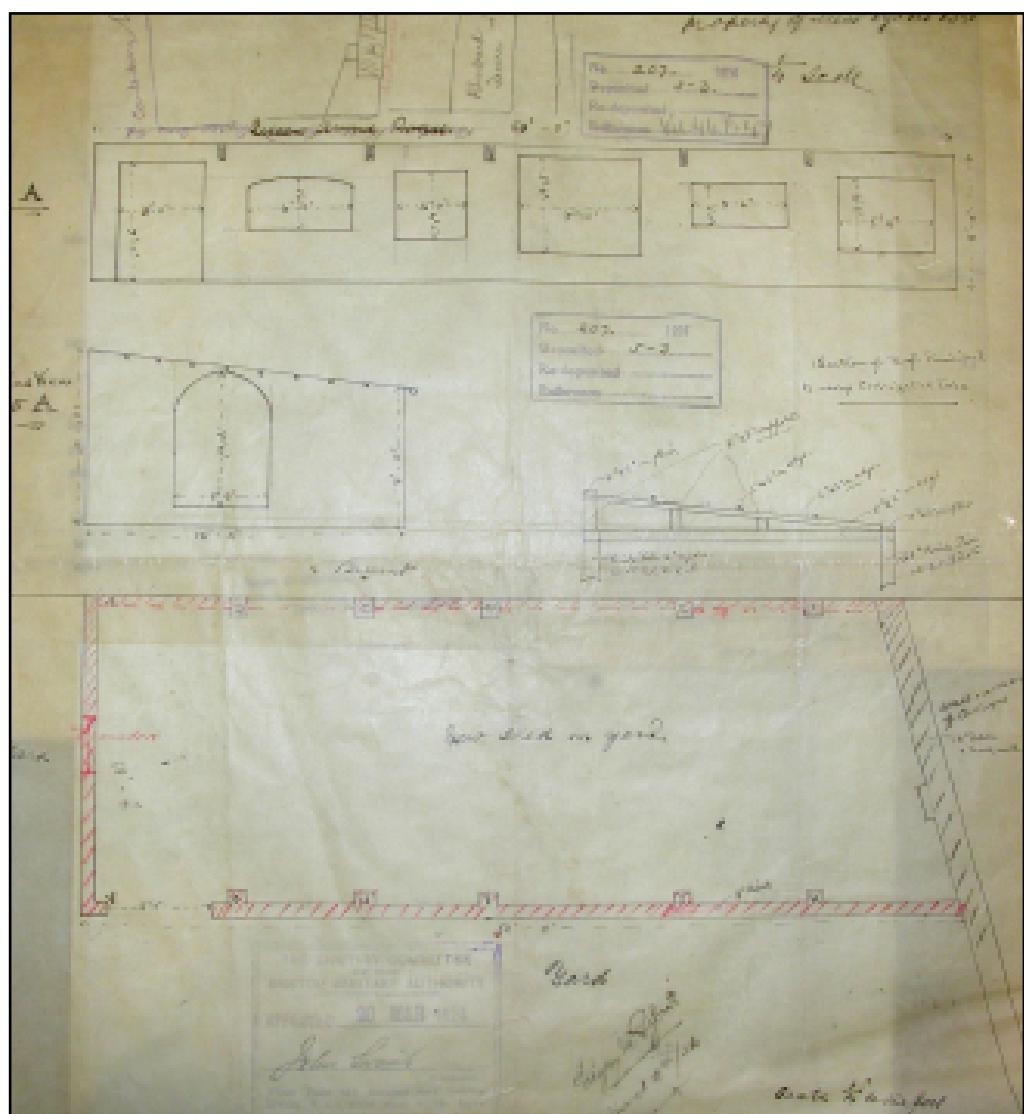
Plan dated 20th March 1924 showing new workshop for Pybus Bros. Candle manufacturers (BRO Building Plan Book Vol. 46 folio 47)
